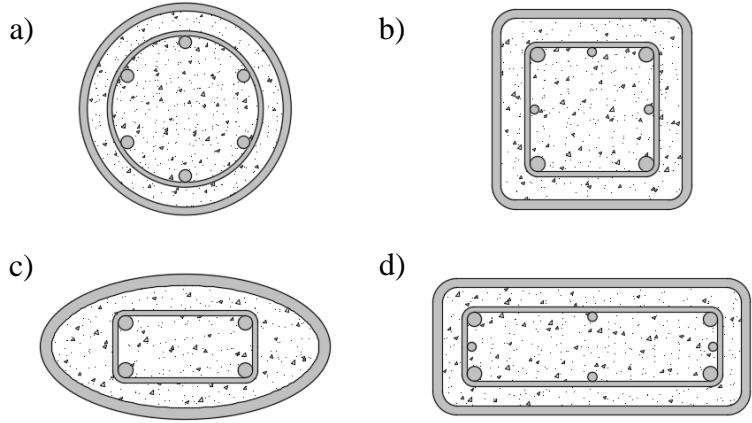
Different CFST cross-section geometries: a) circular; b) square; c) elliptical; d) rectangular.
